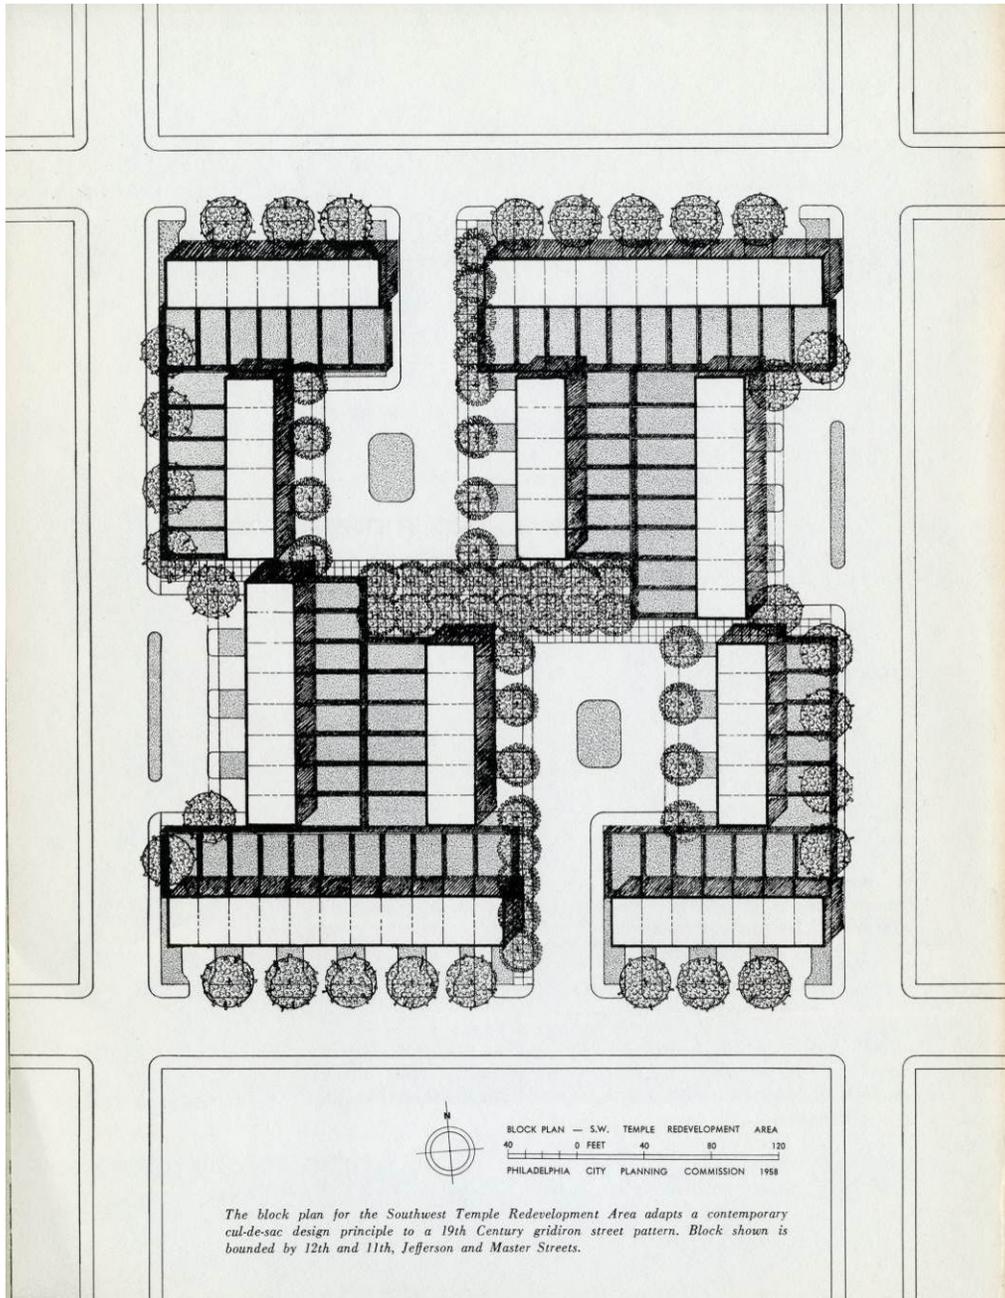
Block plan for a portion of Southwest Temple, from the Philadelphia Planning Commission's 1958 Annual Report. The plan shows the block bounded by N. 11th and 12th, Jefferson and Master streets, essentially as built in Yorktown.
